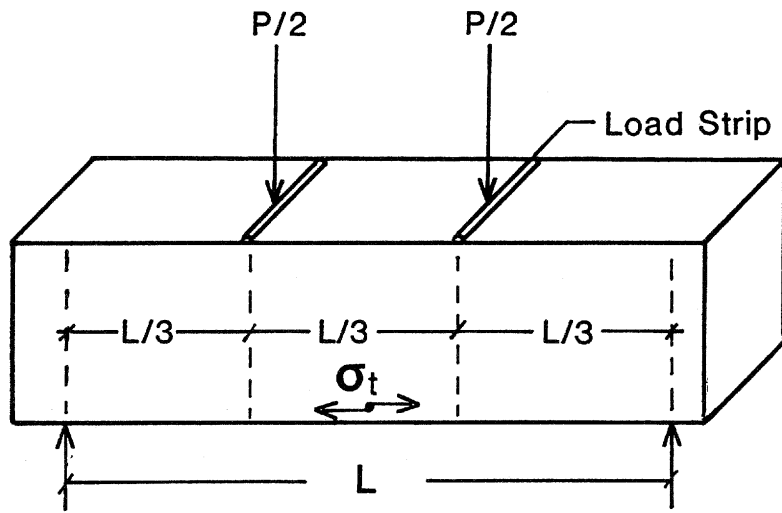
Illustration of Third Point Loading to Determine the Modulus of Rupture of Concrete Beams.
